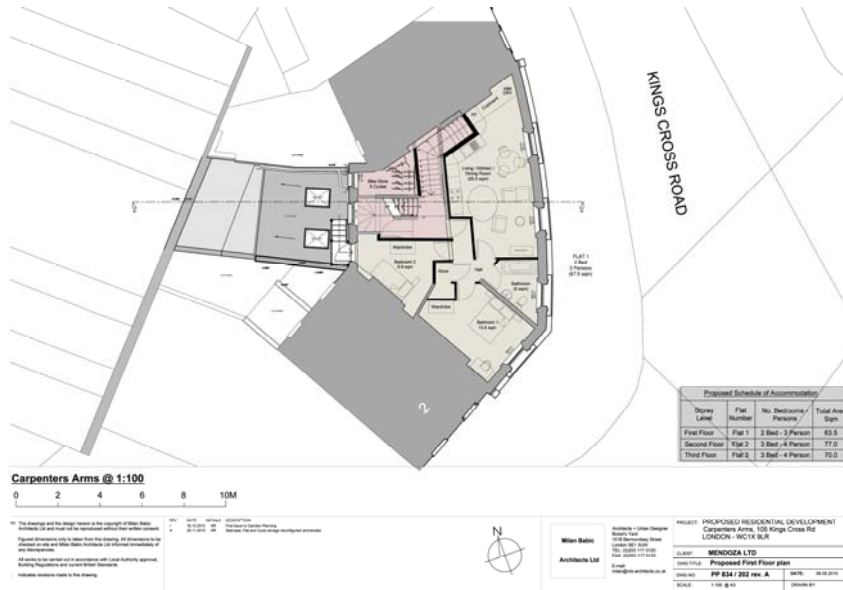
Proposed First Floor Plan – (New walls shown in Black)
